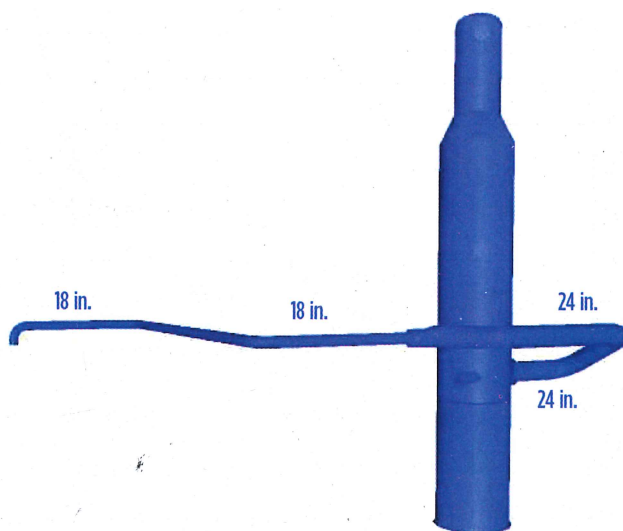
B. 3D model printout of the initial vacuum tower transfer line routing proposal.
